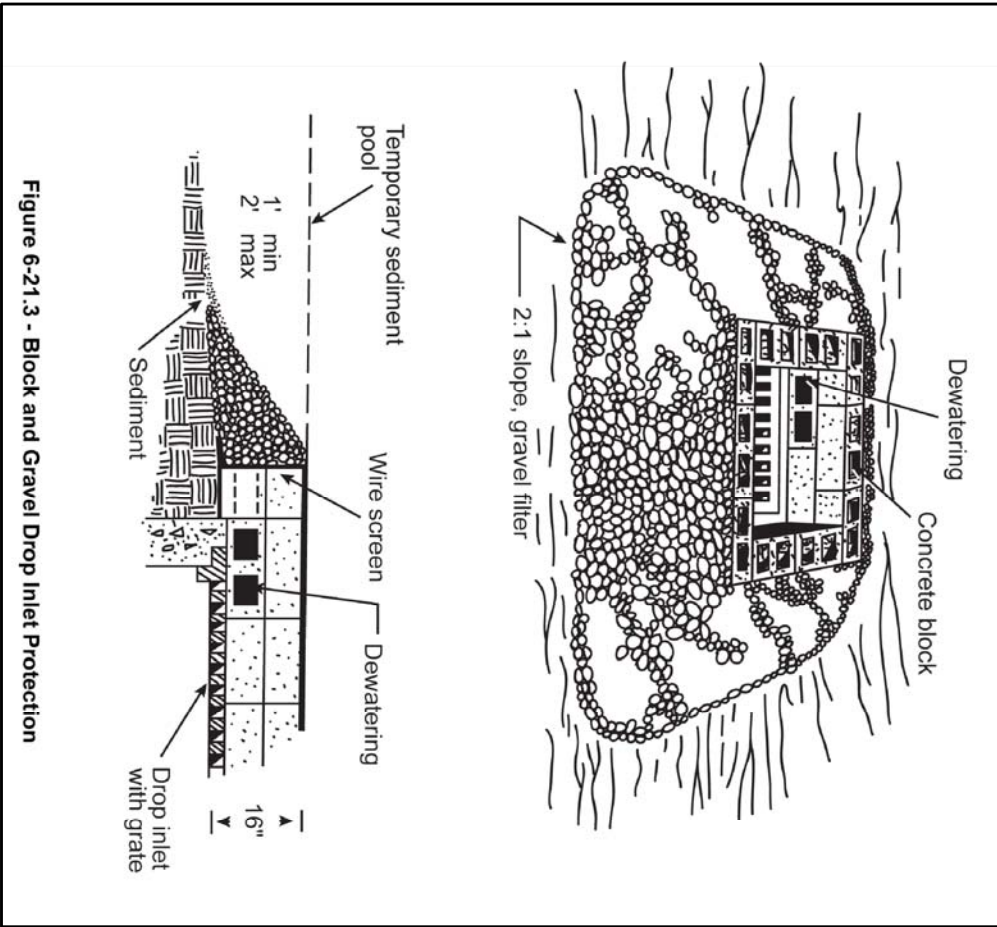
Block and Gravel Drop Inlet Protection
